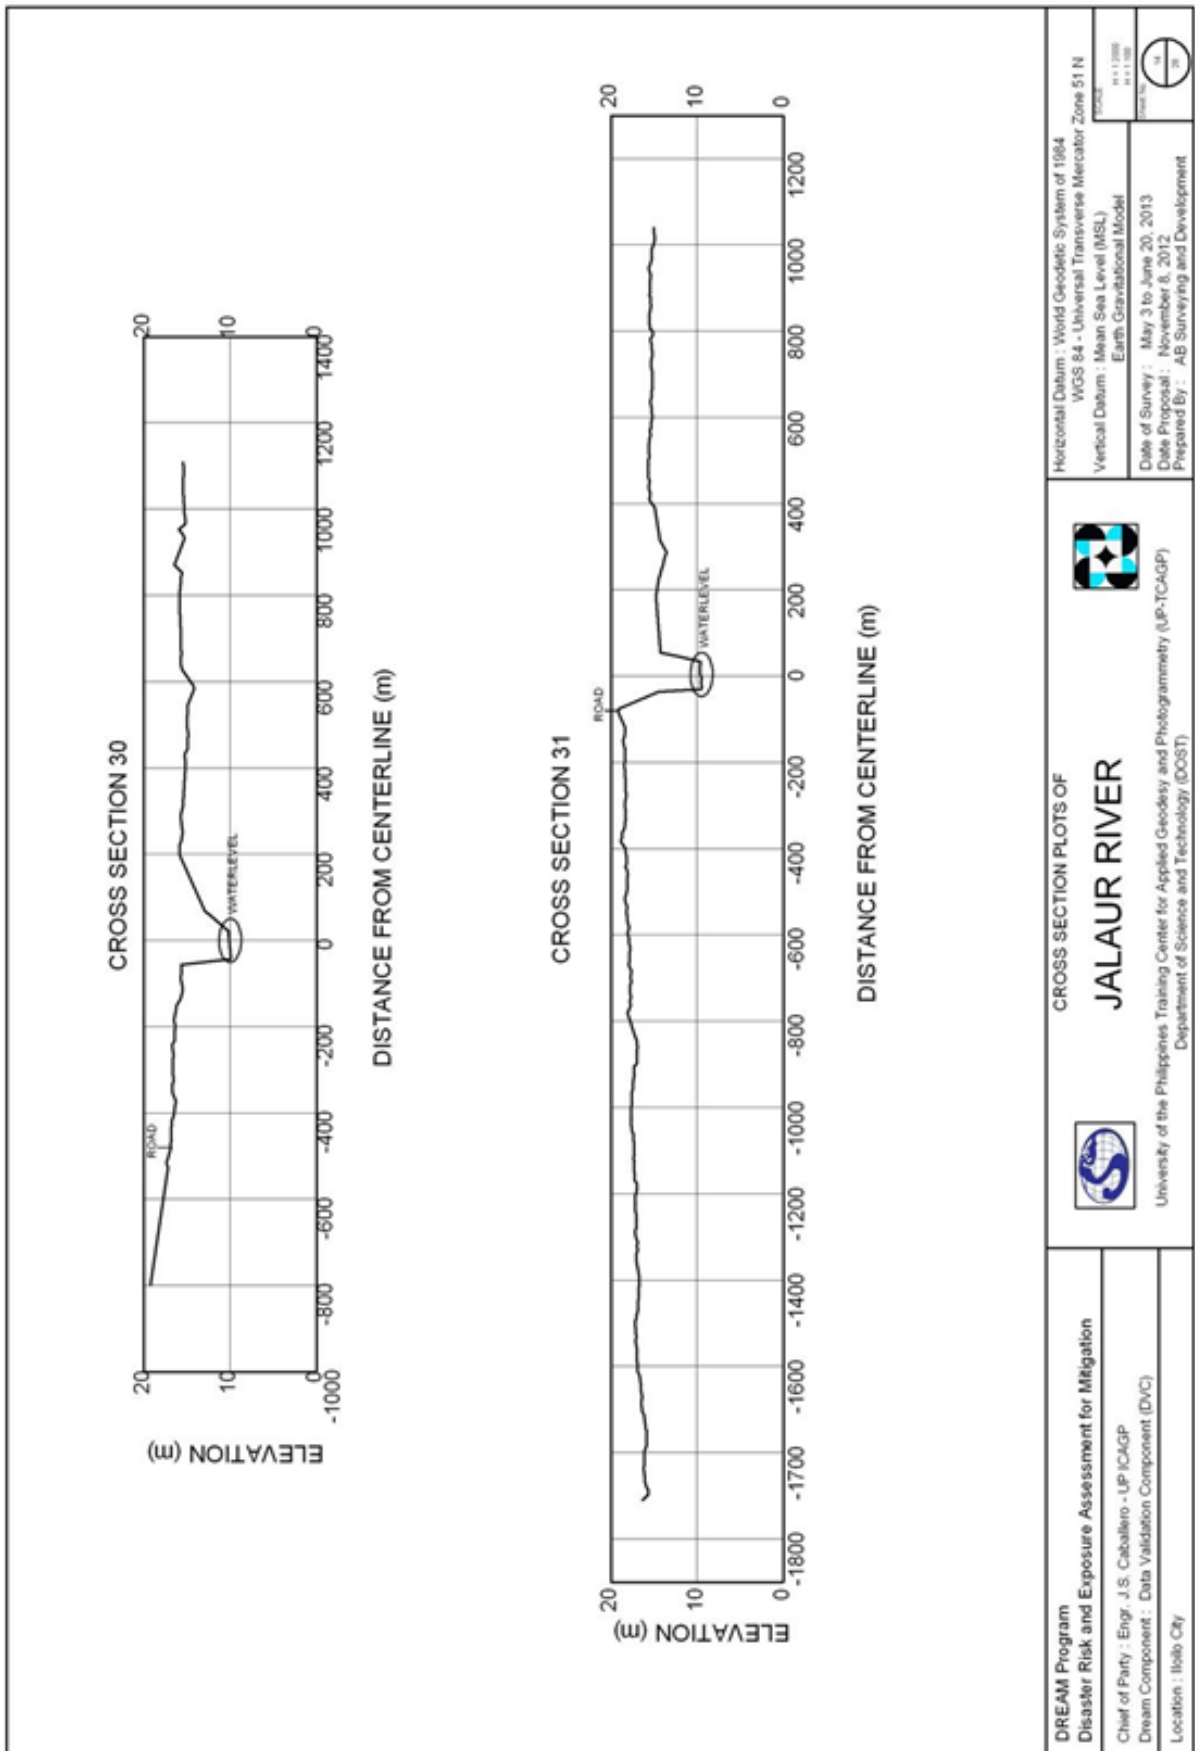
Sheet No.14 of the Cross-section plan of Jalaur River
